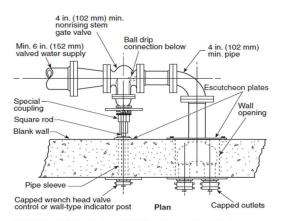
Typical Wall Fire Hydrant Installation.
